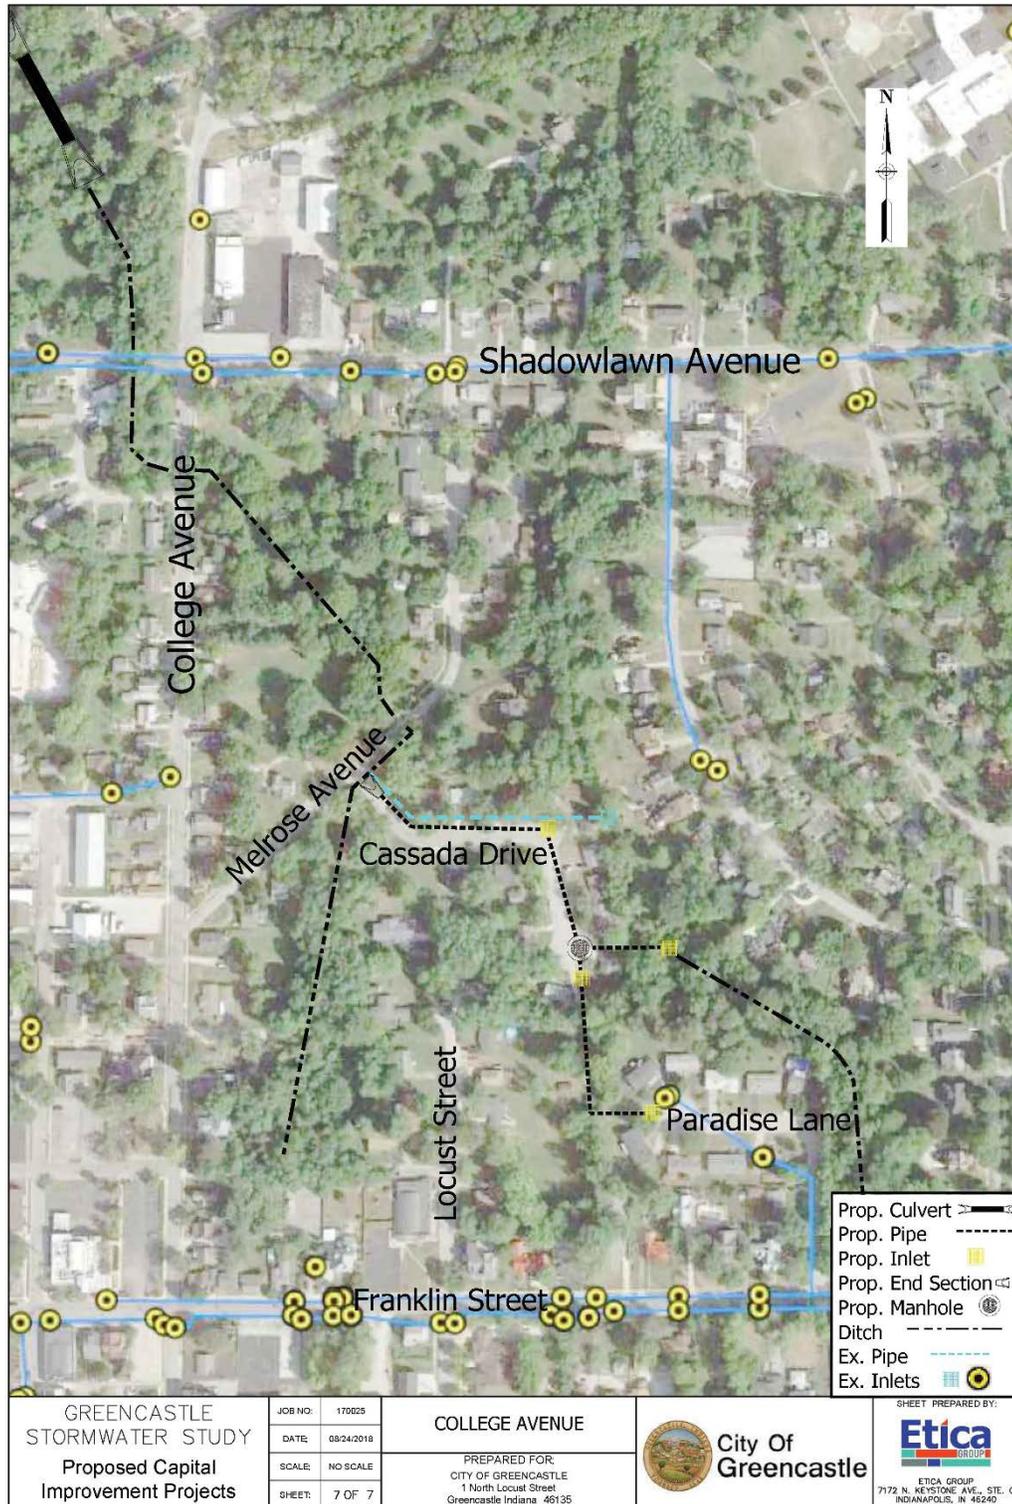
College Avenue, Cassada Drive and Paradise Lane problem area
